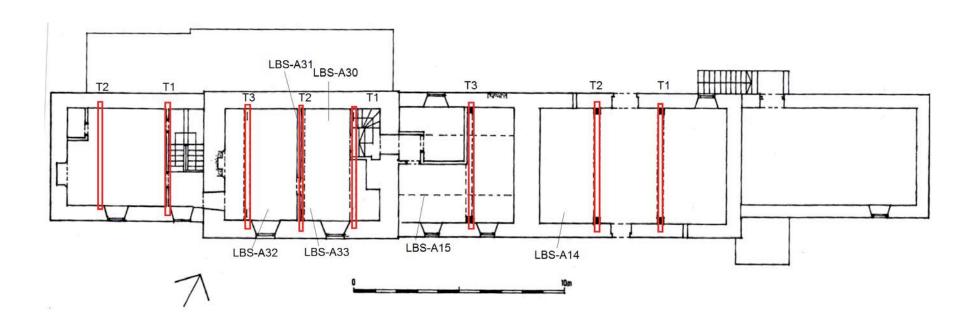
First-floor plan, showing the approximate position of sampled trusses and location of samples LBS-A14—15 and LBS-A30—33 (Martin Roberts)
